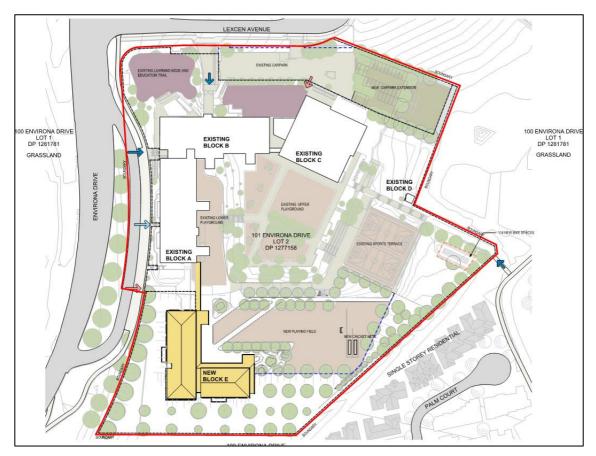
PUBLIC DOMAIN WORKS PLAN
